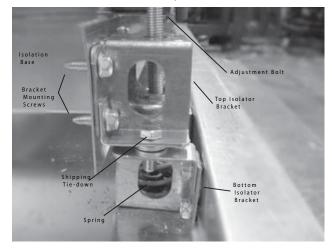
Two-inch Deflection Isolator Assembly
